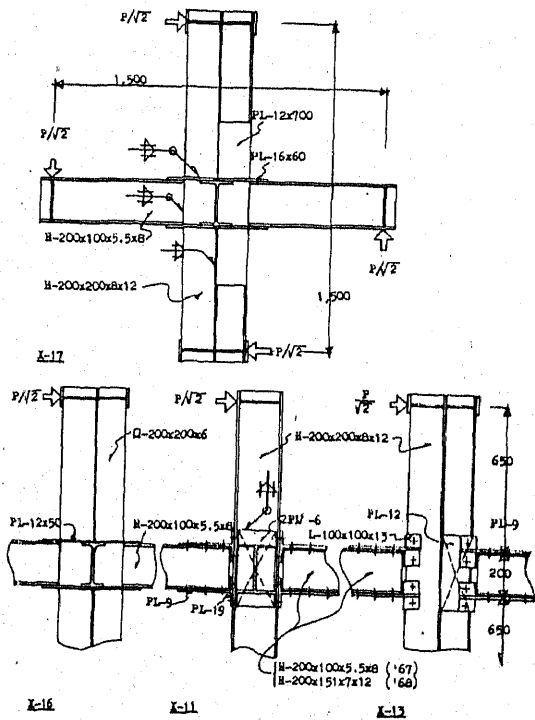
B. TEST SPECIMEN (X-SERIES)
